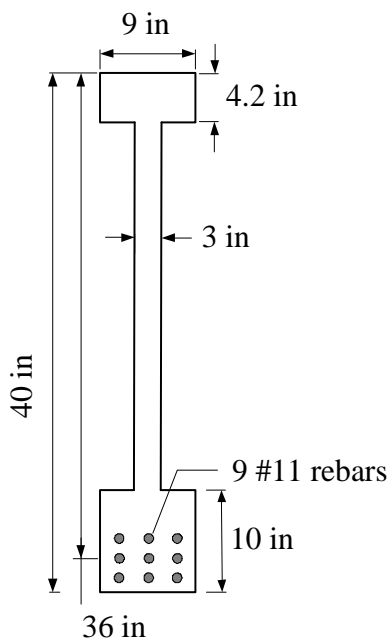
Section dimension and arrangement of longitudinal reinforcement steel rebars for section UHP/St60 40I-1
